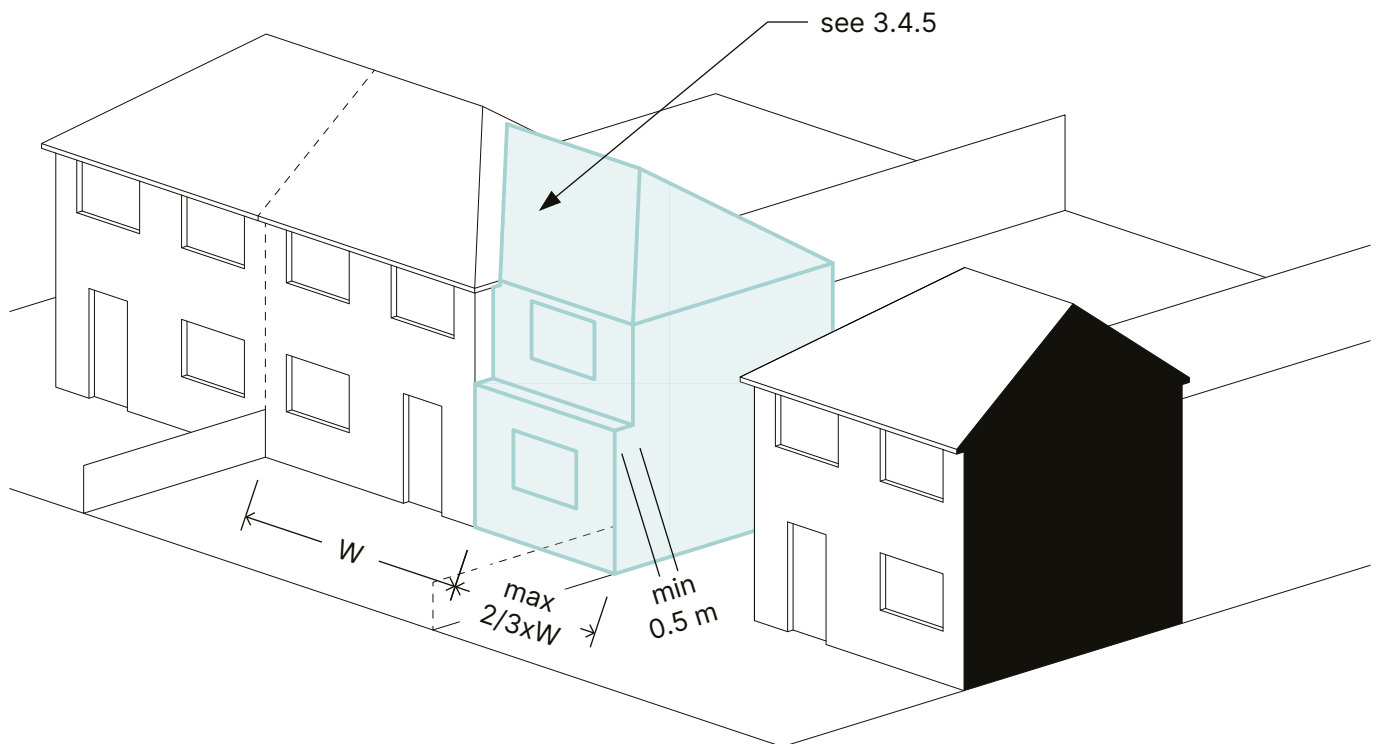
Parameters for two storey side extensions with a setback from the original front wall at first floor level
